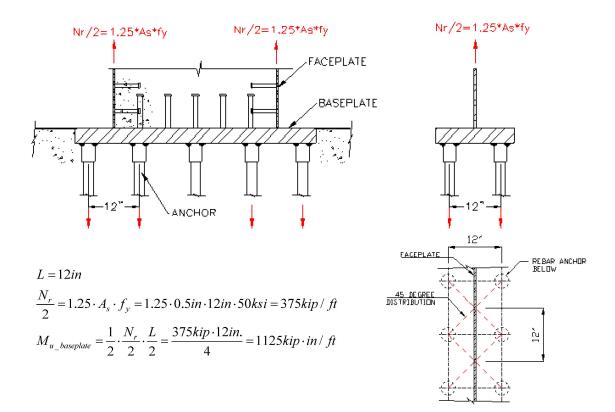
Calculation of Baseplate Moment for SC Wall Basemat Anchorage
